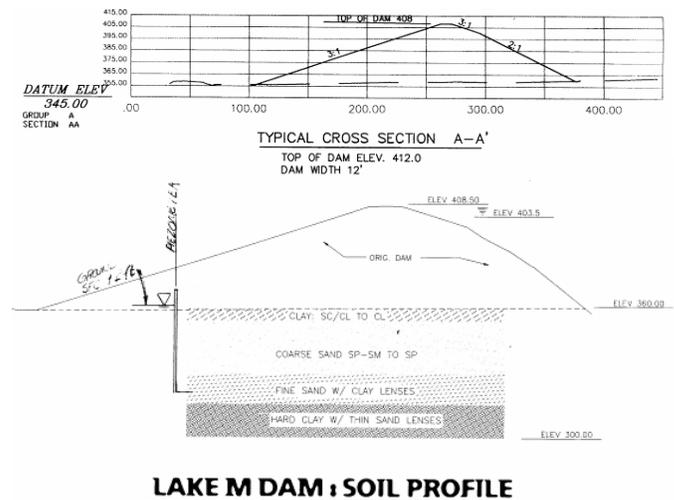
Lake Mailande Dam—Typical Section and Soil Profile
